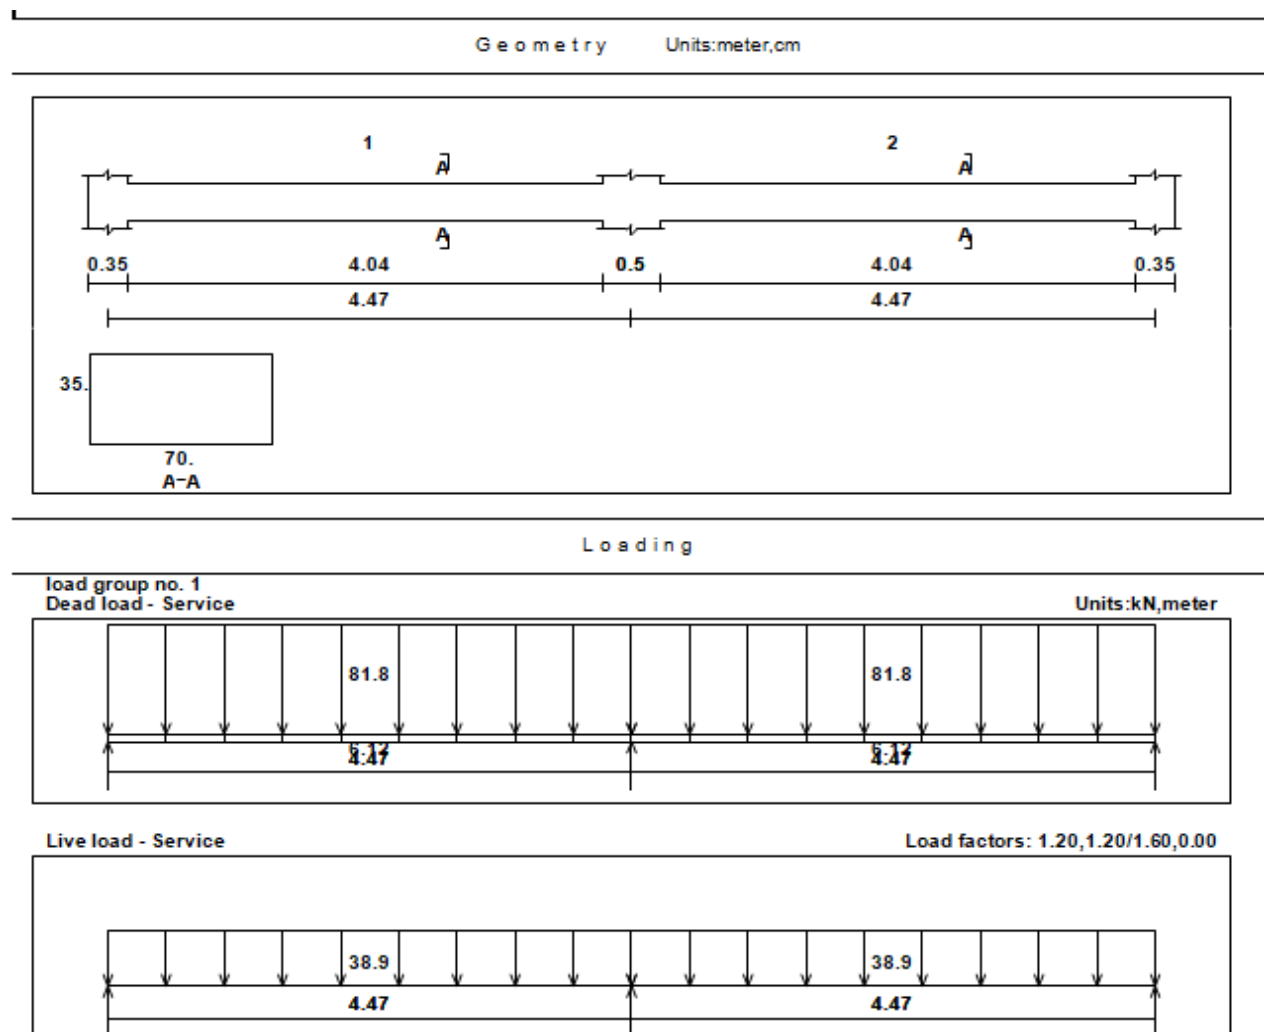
Statically System and Loads Distribution of Beam (B,G71).
